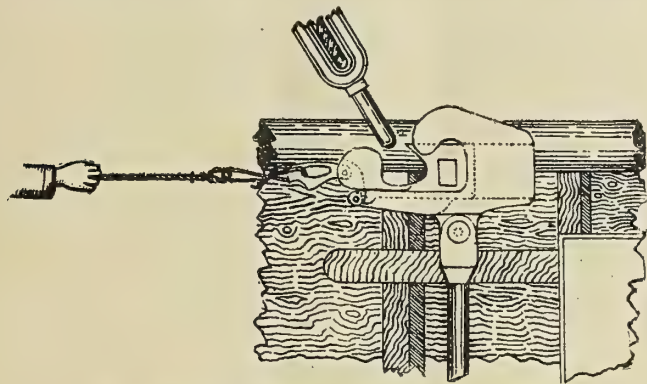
HILLS DEVICE UNLOCKED AND DISENGAGED.
